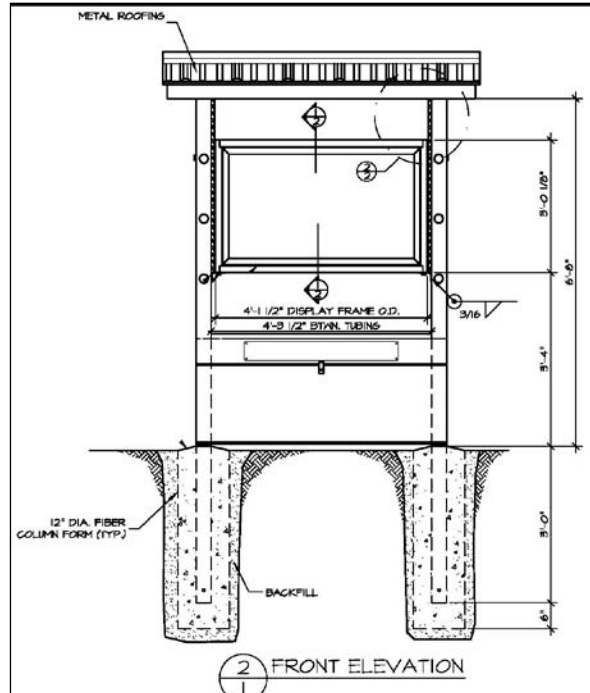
Signage examples presented at the MSB Trail User Open House (10/27/11)
